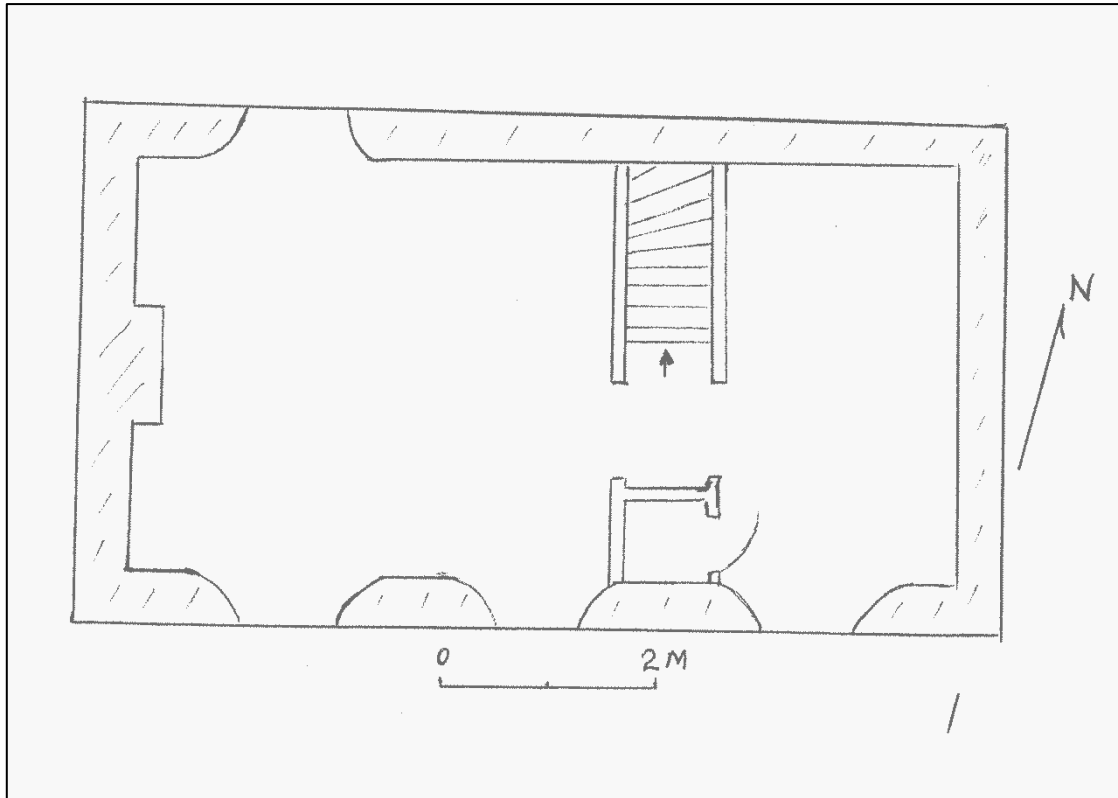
Plan of the Second Floor of the Circa 1720 Taylor Farm House. The house at this elevation measured 27.6 by 15.4 feet (8.4 by 4.7 m). The second floor had three windows at the front (south side) and one at the rear or northern surface. The window openings had curved walls. The stairway, curved at the bottom, divided the area into two rooms, the larger twice the size of the smaller. A closet set against the south wall and between two windows was directly opposite the stairway. The closet door opened into the smaller room. The front central window was somewhat narrower than the other three windows. The only chimney, with fireplaces on both floors, was centered at the west end.
